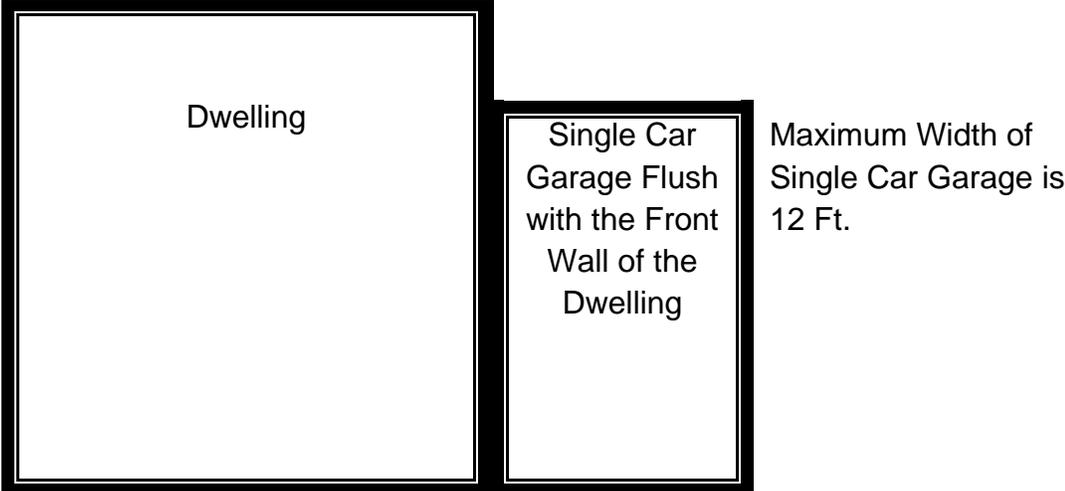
Single Car Garage Flush with Front Wall of Dwelling
